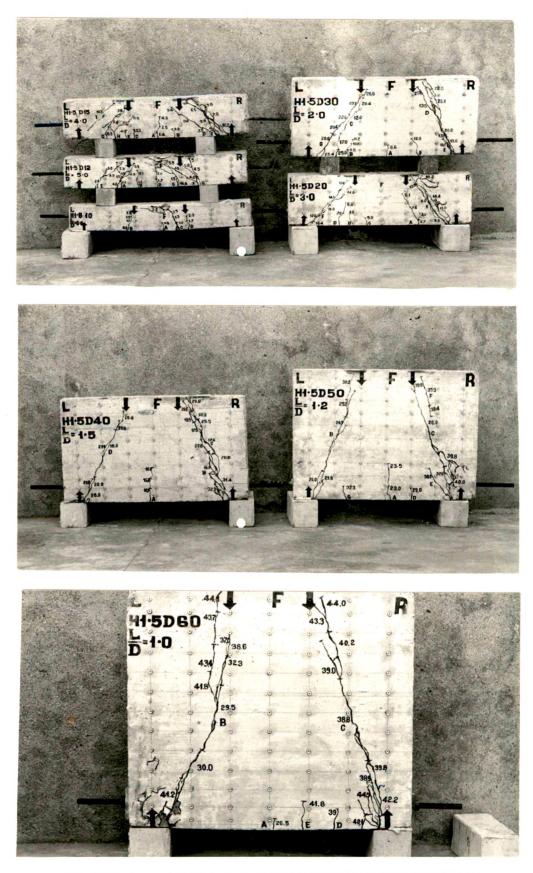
BEAMS OF 1.5% LOWER HALF DEPTH FIBRE CONDITION AFTER FAILURE
